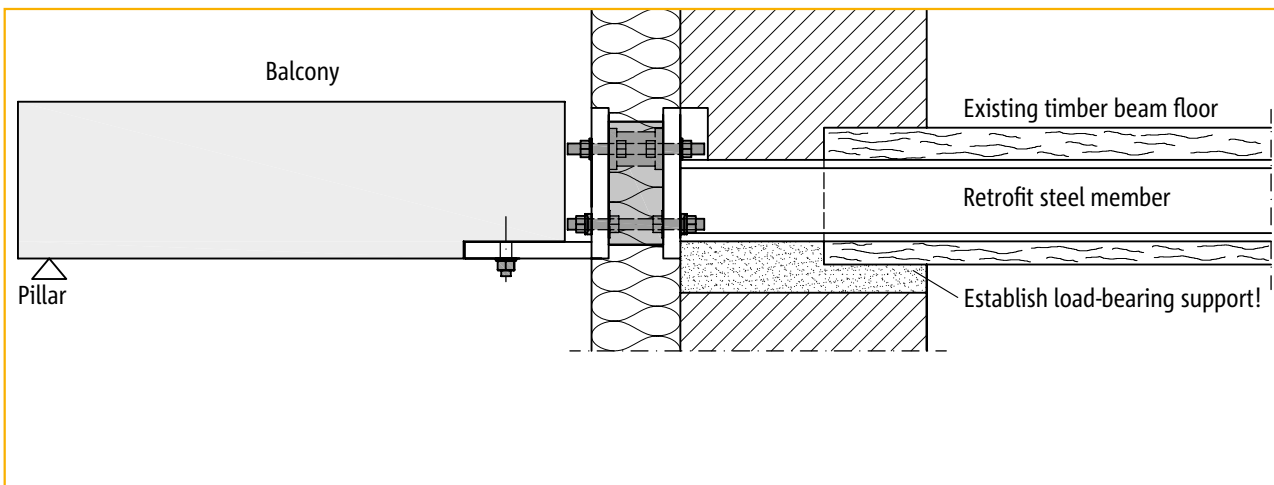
Balcony supported, connected with type KST on timber beam floor (concrete prefabricated component)
